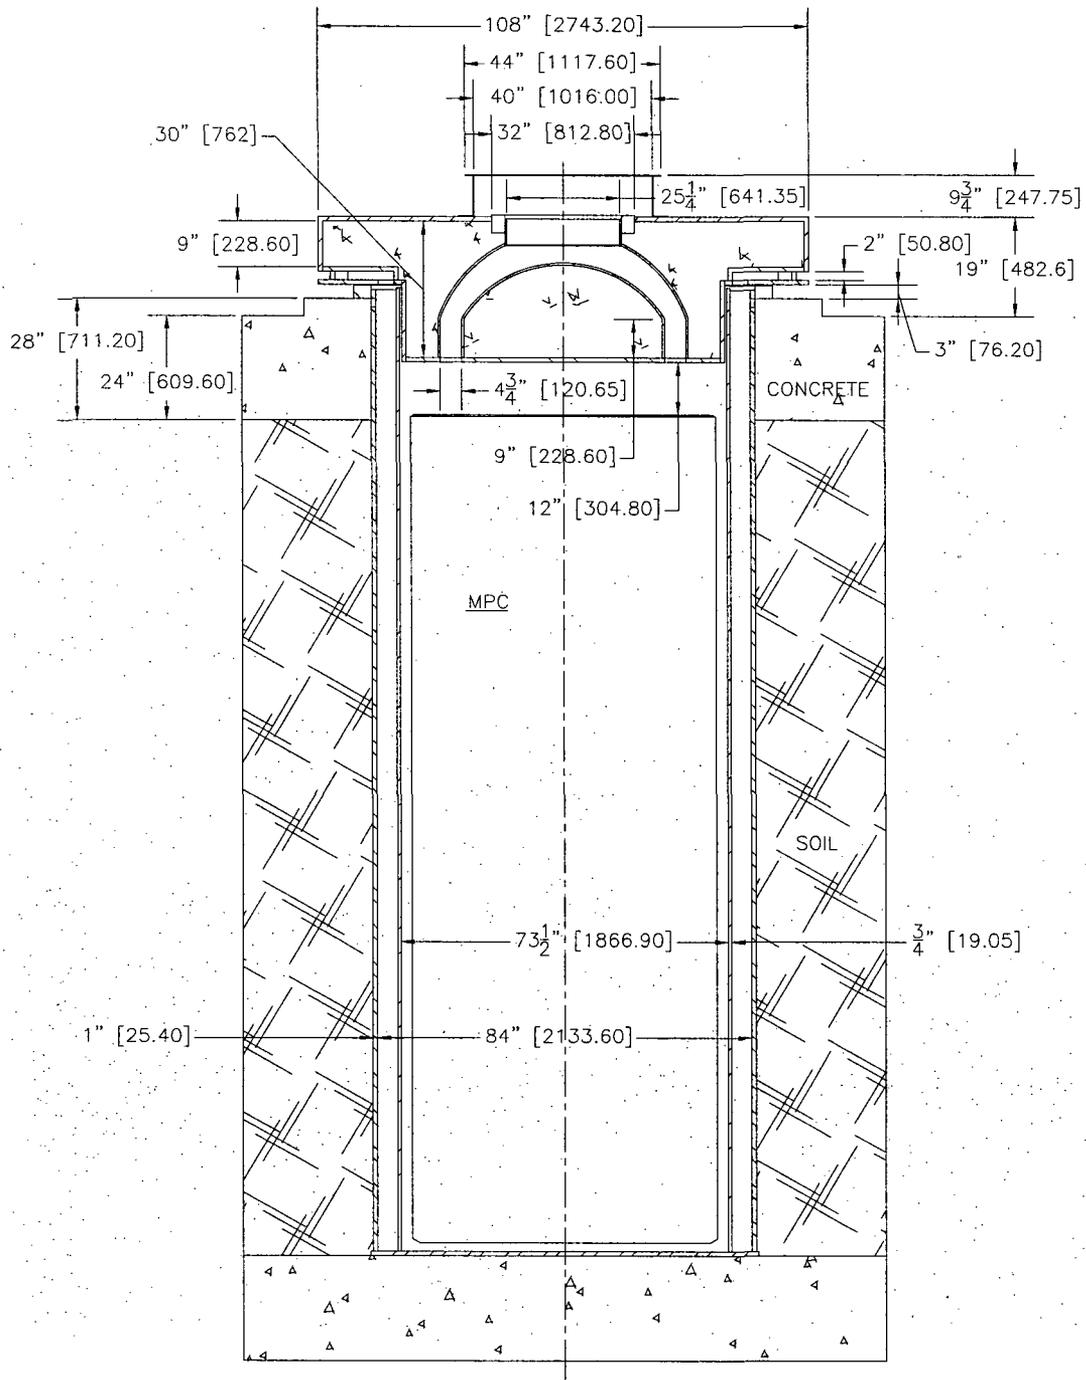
; HI-STORM 100U MODULE CROSS SECTIONAL ELEVATION VIEW. VALUES IN BRACKETS ARE IN MILLIMETERS.
